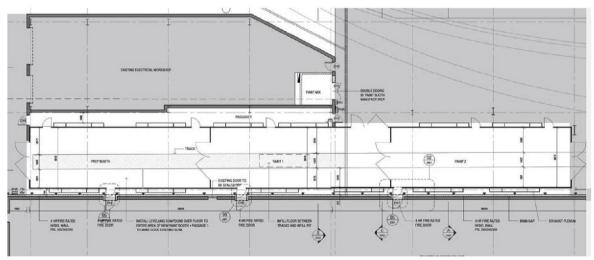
Excerpt from Paint Workshop Plan (Drawing No 2001)
